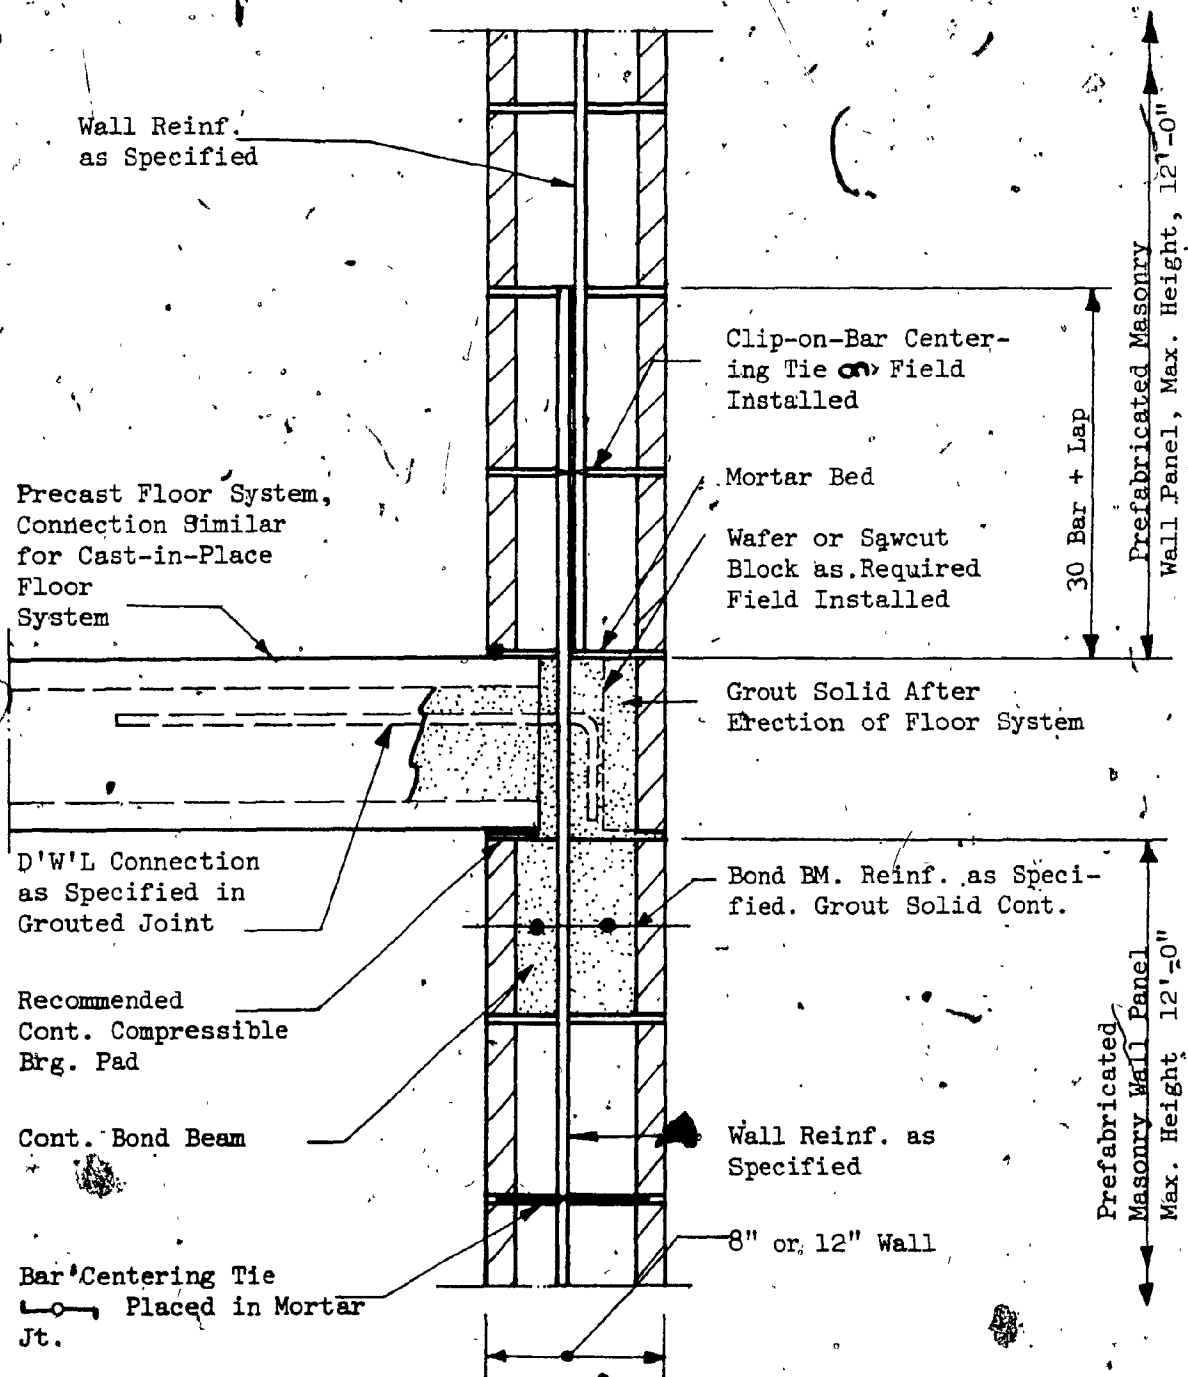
Typical Floor Connection to Exterior Wall.
